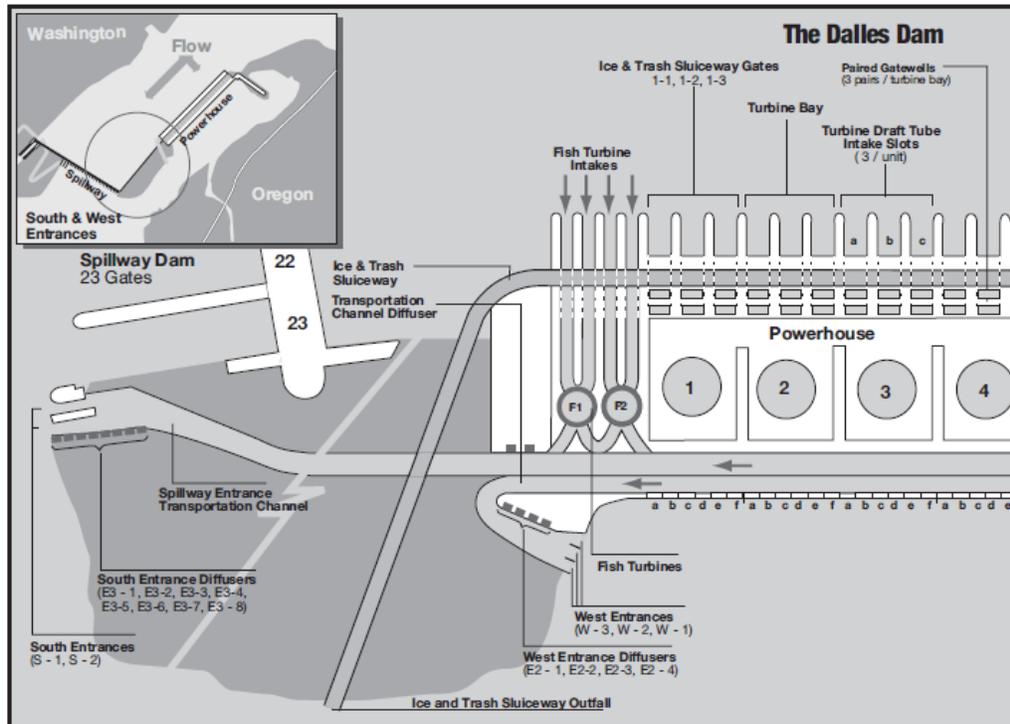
The Dalles Dam East Fish Ladder (USACE 2008)
